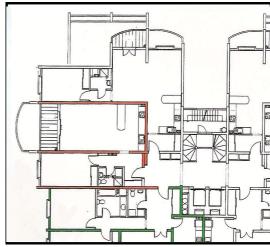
Detail of floor plan in Albatros Apartment Building (17-19th floors)
